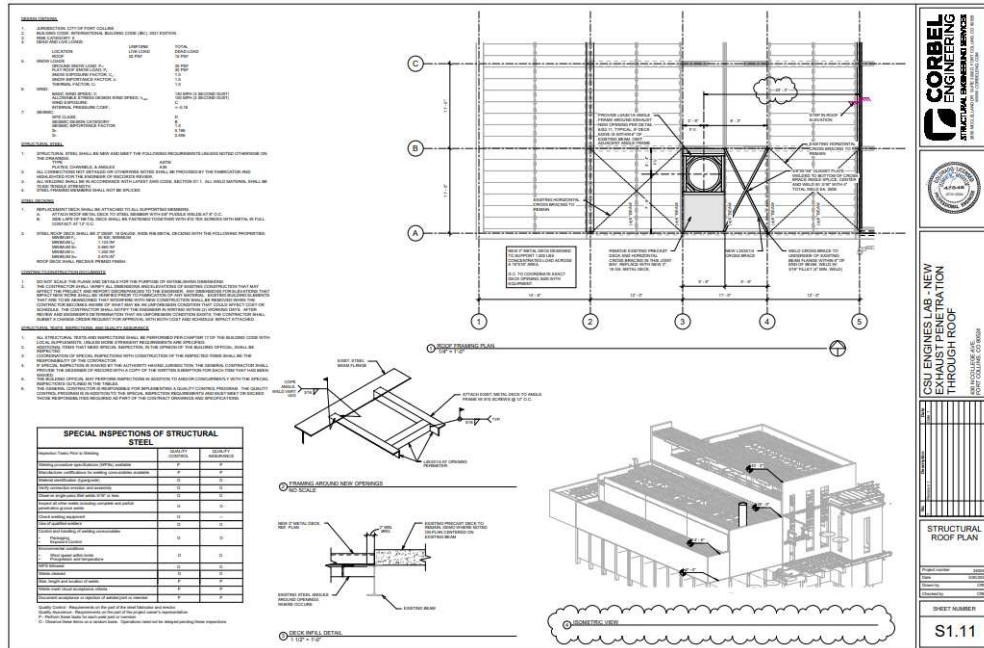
Corbell engineering roof redesign for additional load bearing of thimble installation. The design depicted in Figure 44 was executed in a joint effort between the CSU powerhouse team and hired contractor, Hillside Construction.
